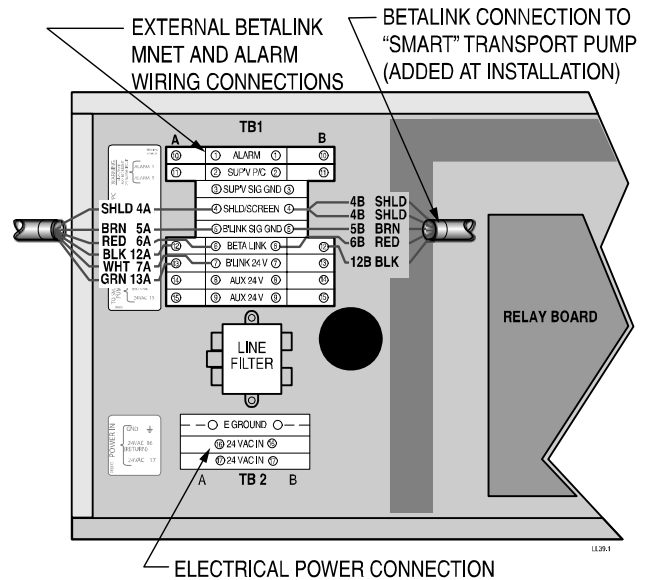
Pump box terminal strip, electrical and BetaLink connections.
